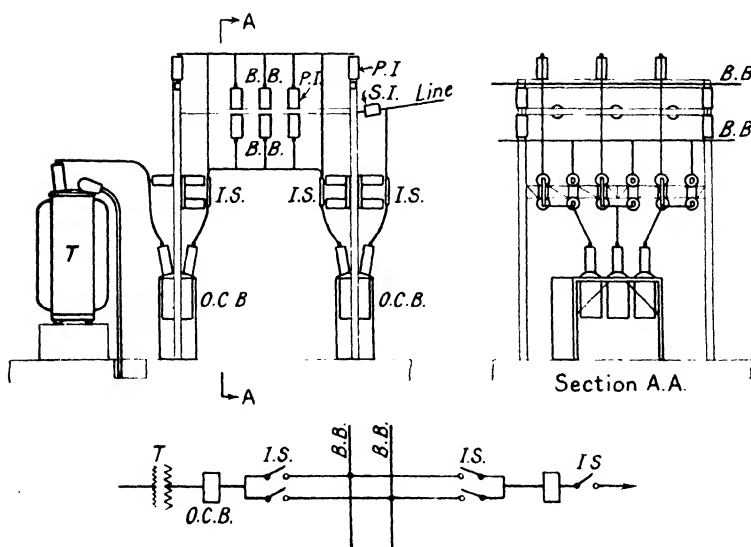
A SIMILAR ARRANGEMENT TO FIG. 11, BUT ARRANGED WITH DOUBLE BUS-BARS
